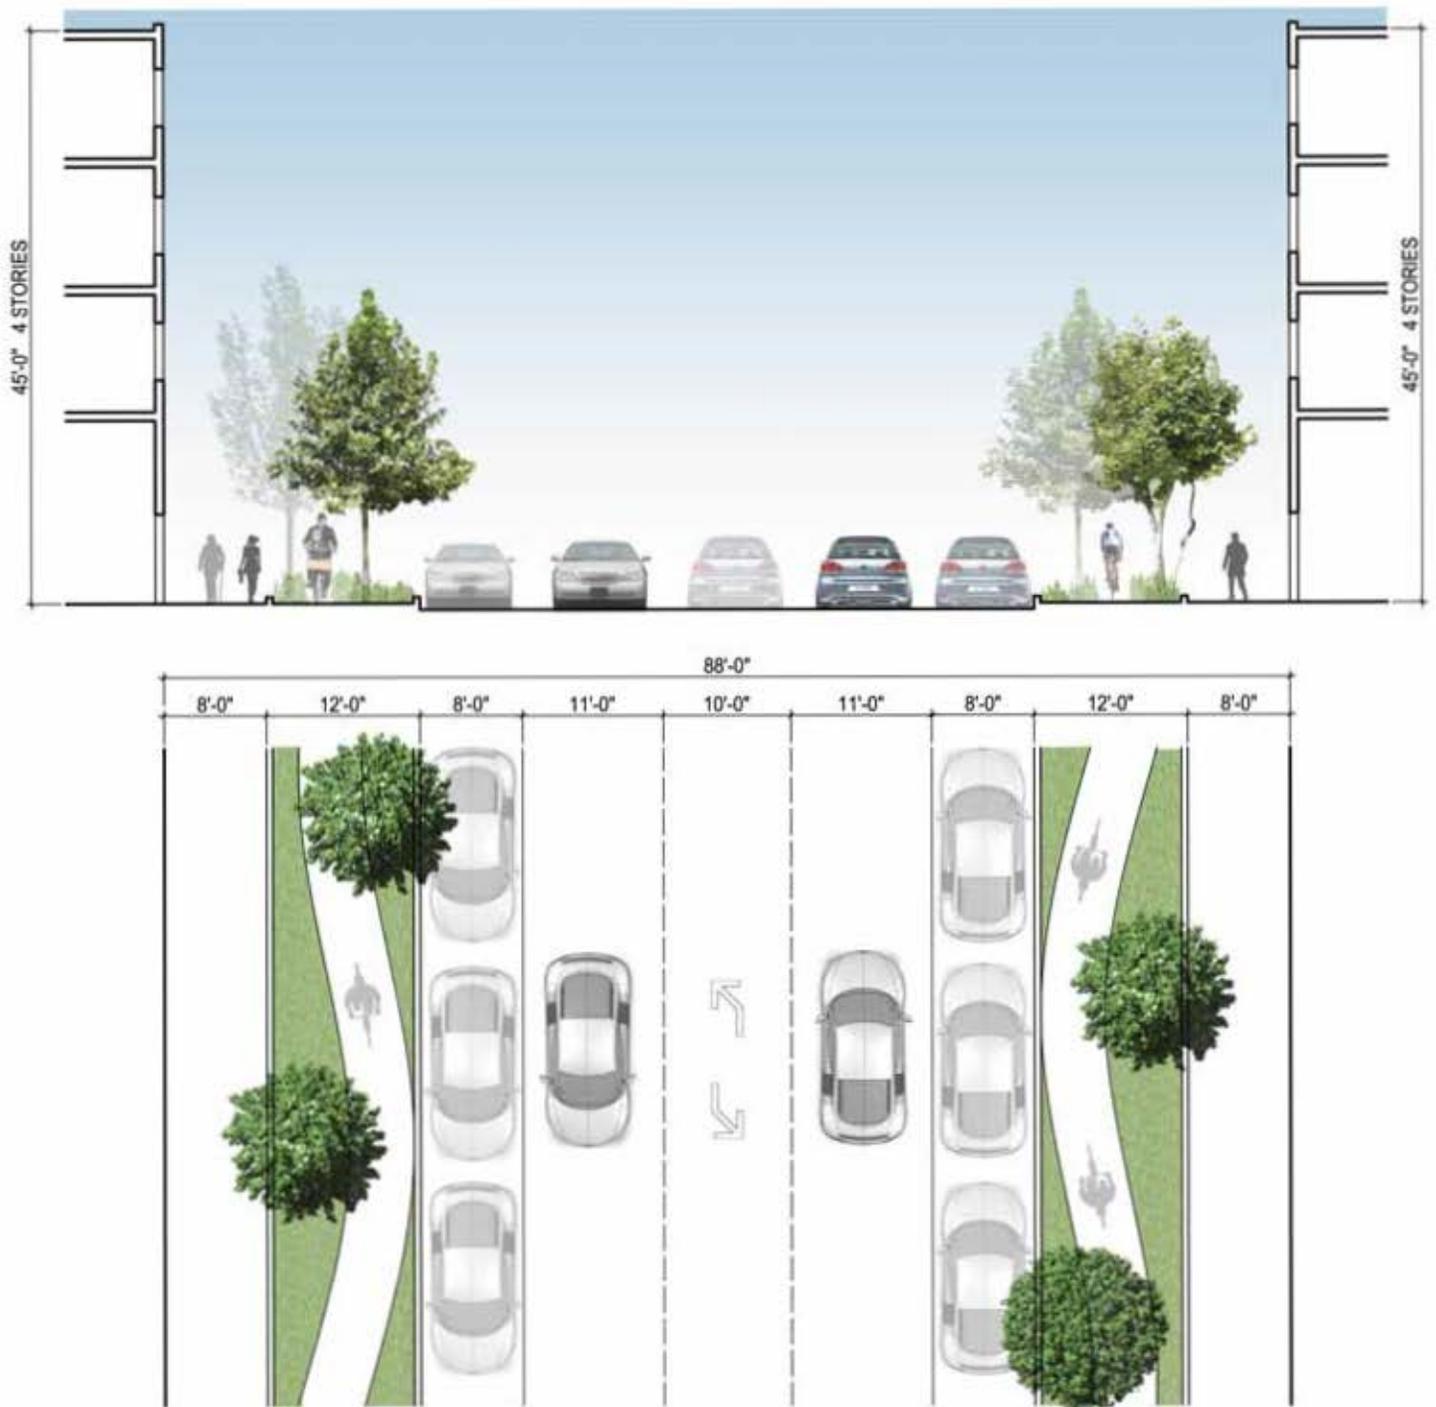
Street Plan and Section - Hallock Ave. to Rt 347 with parking and bicycle lane in planting strip
